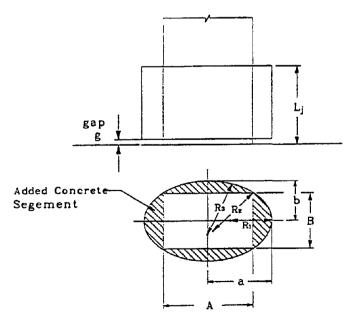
Confinement of Rectangular Column Base with Oval Carbon Jacket and Added Concrete Segments
